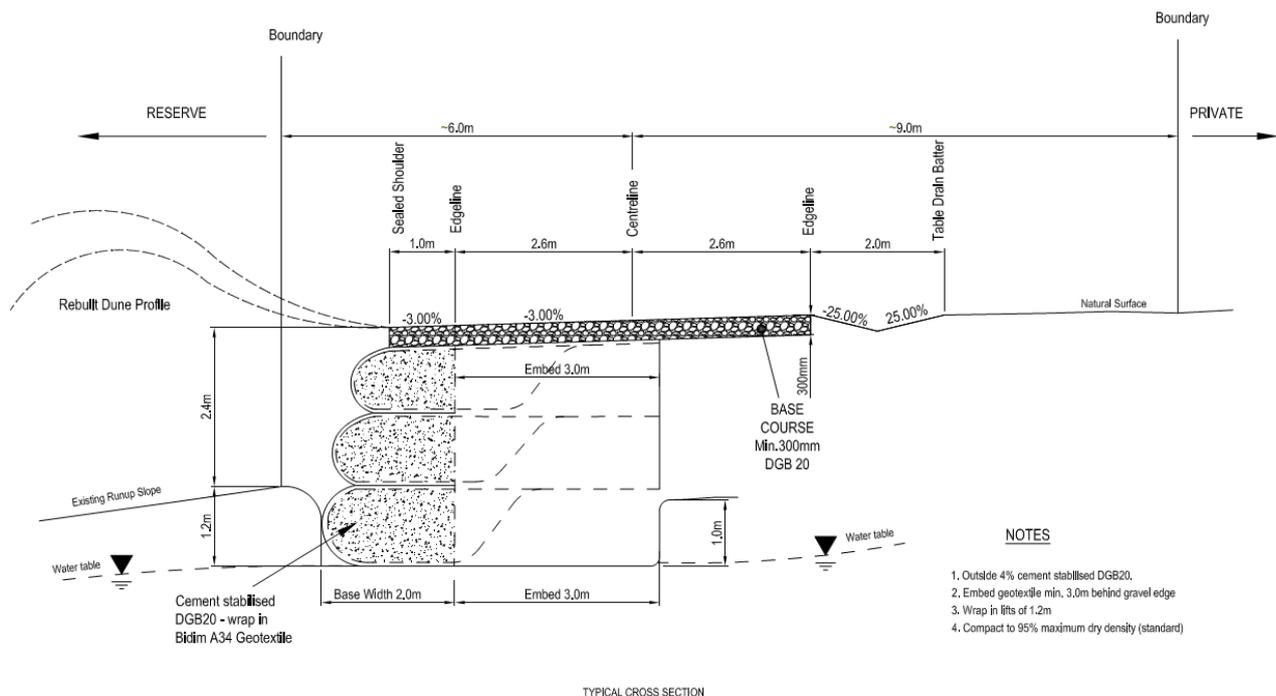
Typical section for reinforced substrate adopted for road reinstatement
